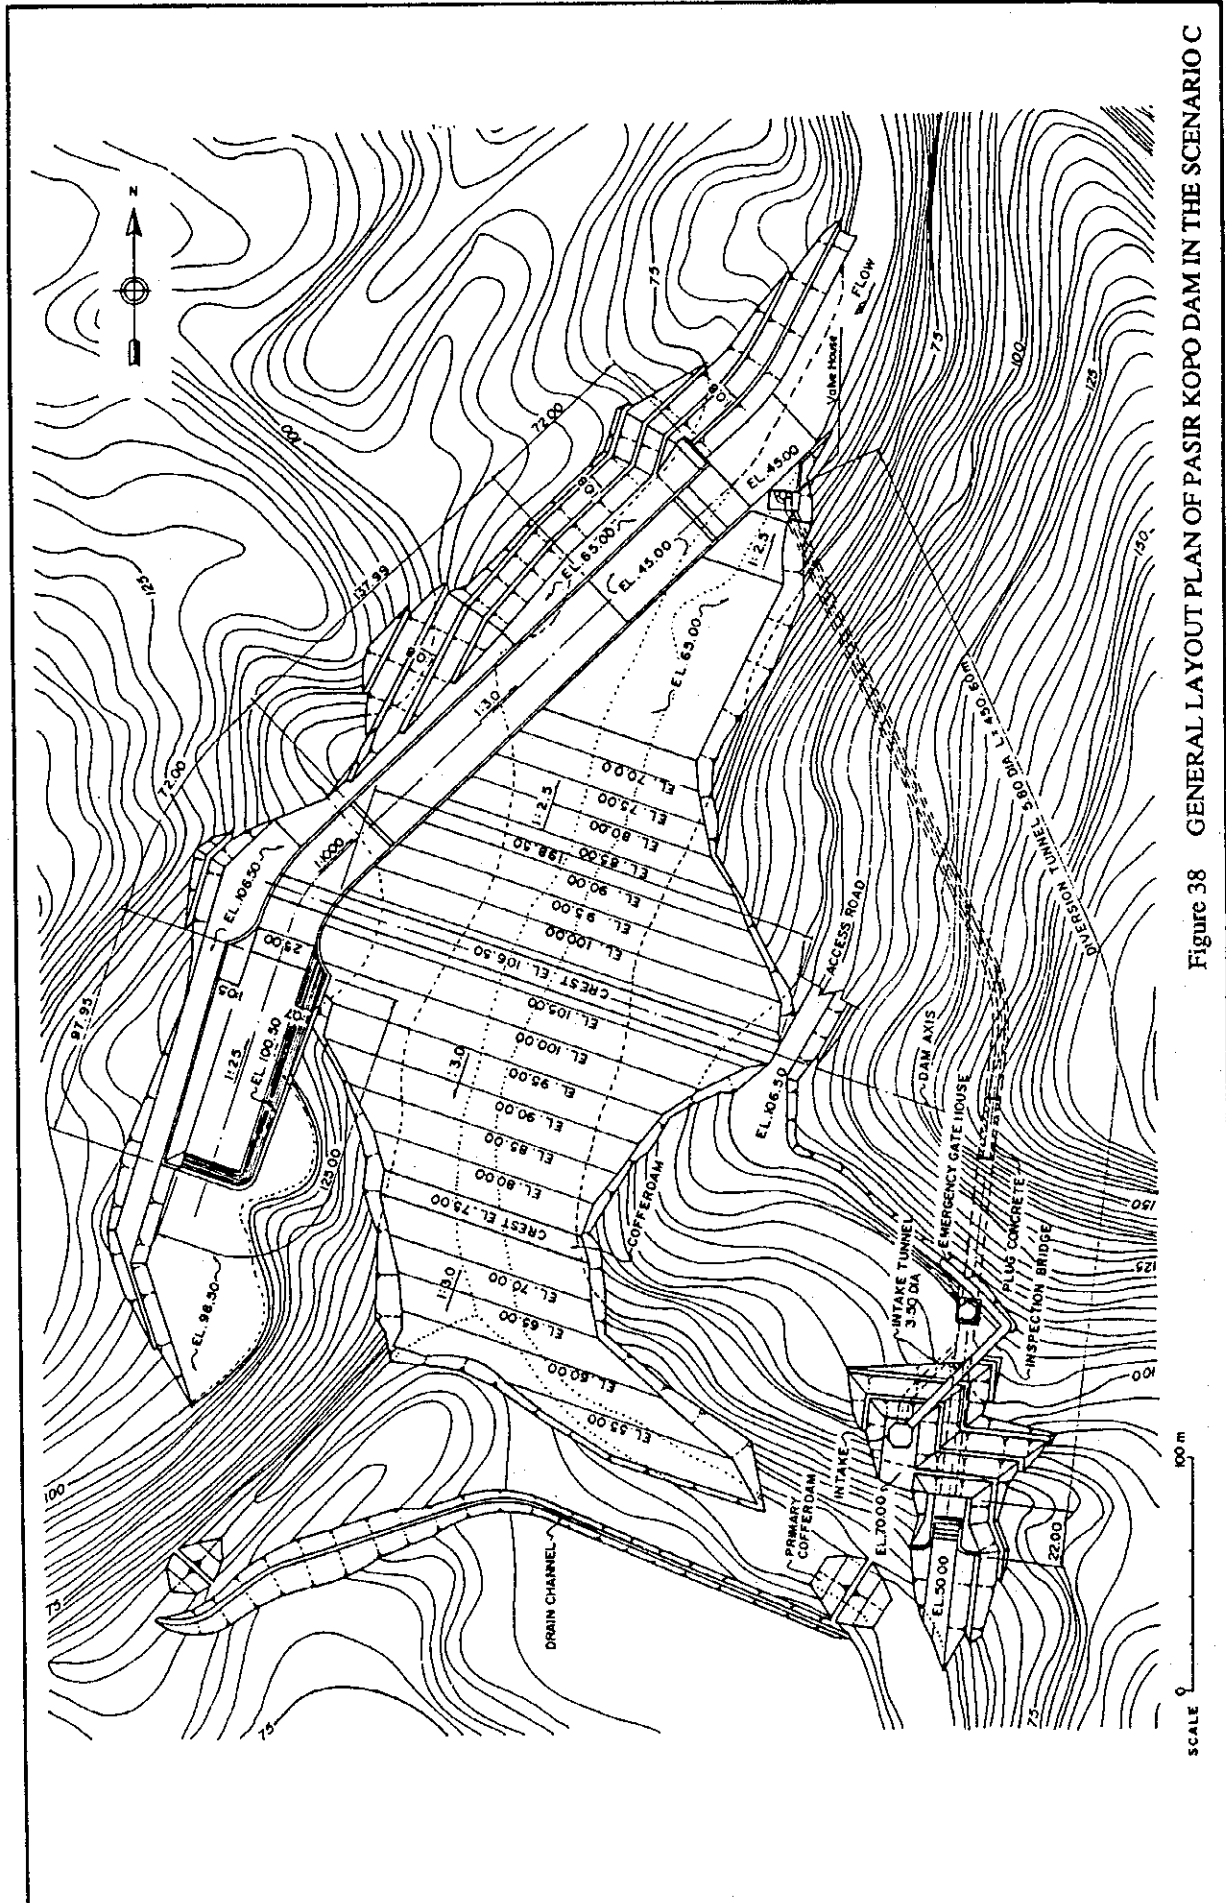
GENERAL LAYOUT PLAN OF PASIR KOPO DAM IN THE SCENARIO C
